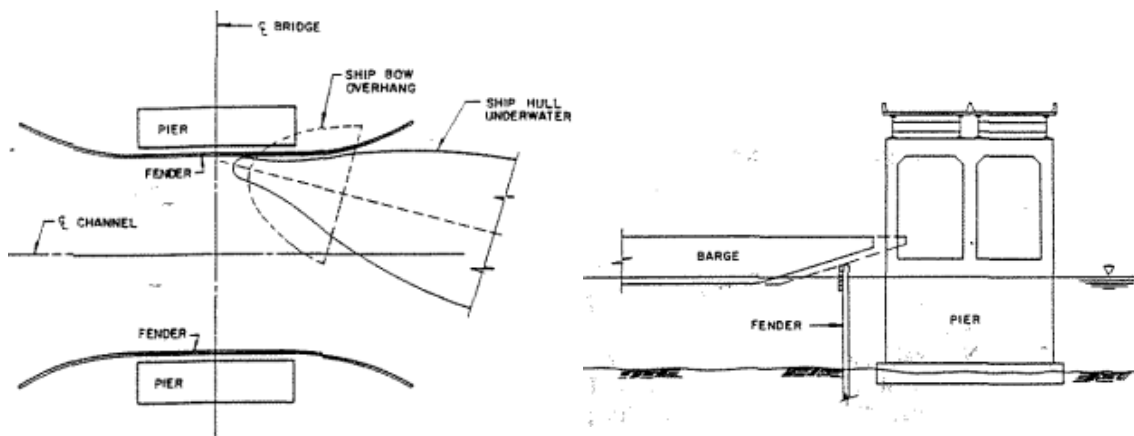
Plan of overhang and elevation of Barge Bow ship collision with pier (Knott, 1990)
